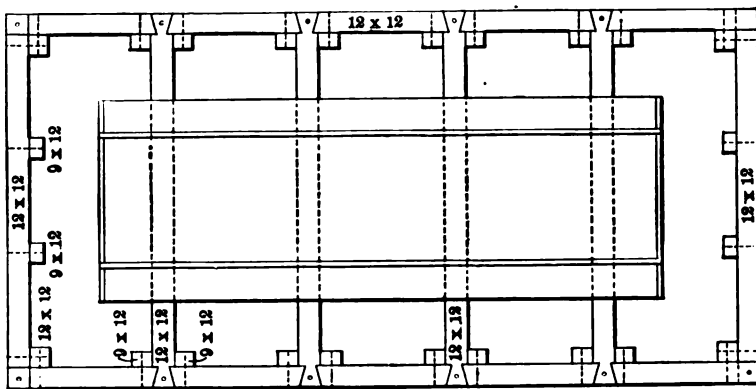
ARNPRIOR BRIDGE, CRIB AND COFFER-DAM, CANADIAN PACIFIC RAILWAY.
